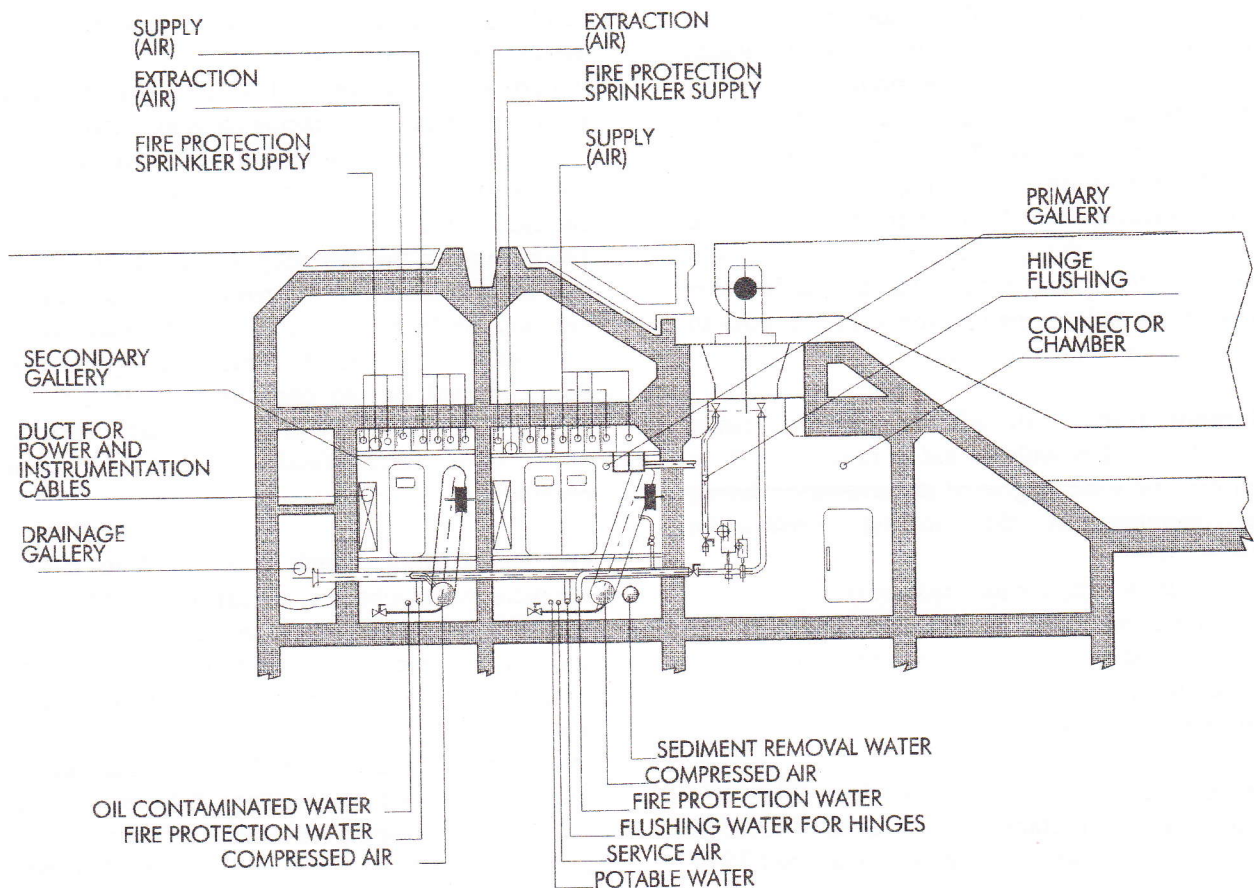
Electromechanical equipment to be installed inside the foundation (cross section)
